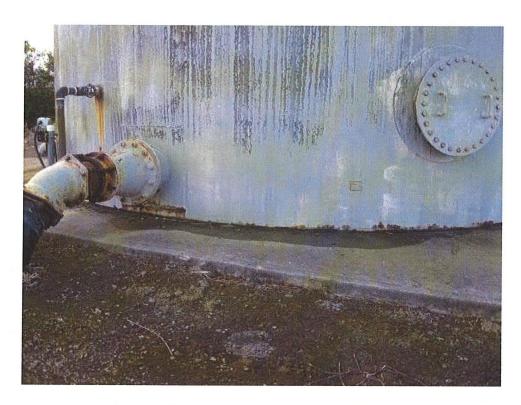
Hamakuapoko Well No. 1 Storage Tank (South View)
